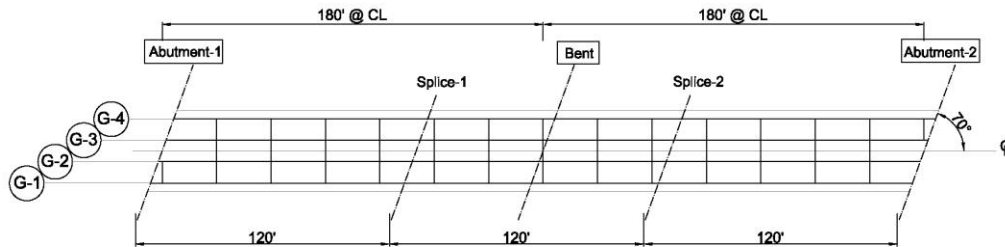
Simplified Framing Plan of Bridge S8: Two-Span, 70° Skew.
